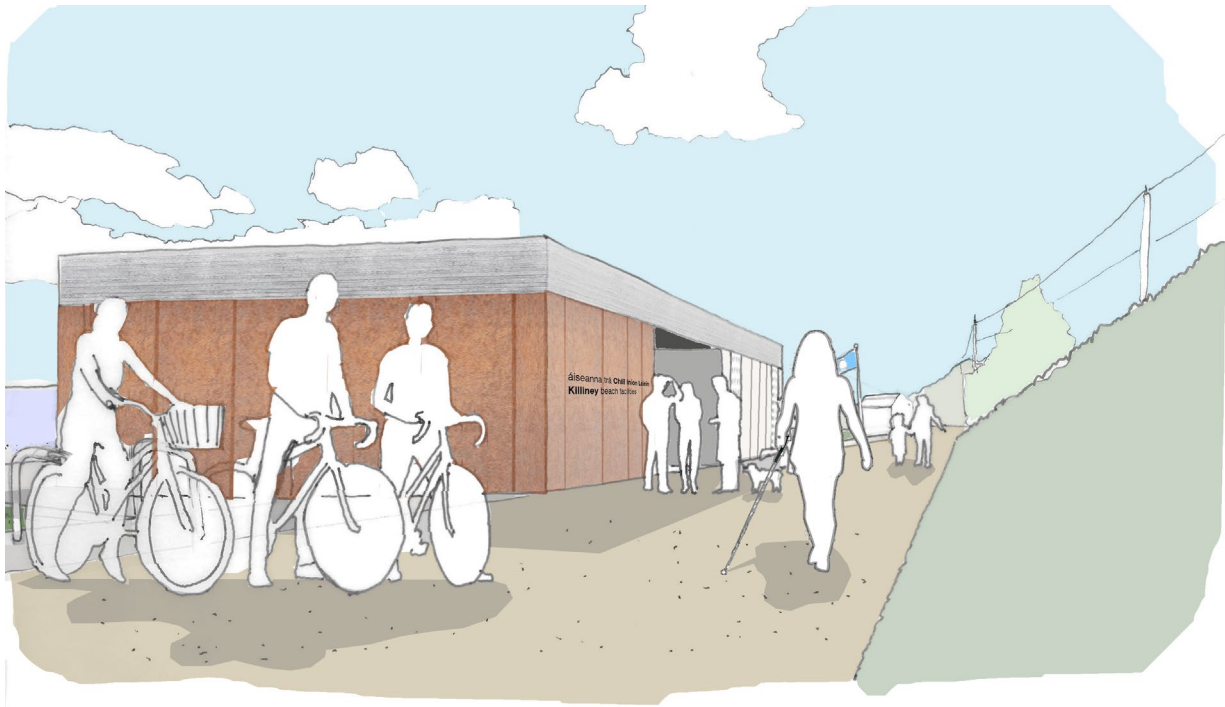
Artist's impression of proposed development looking south from Killiney beach parking
